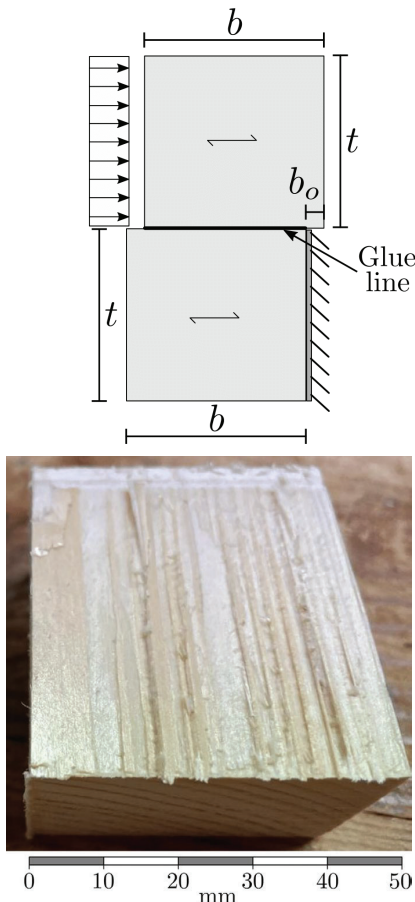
Shear tests: (up) dimension and setup; (down) failure surface
